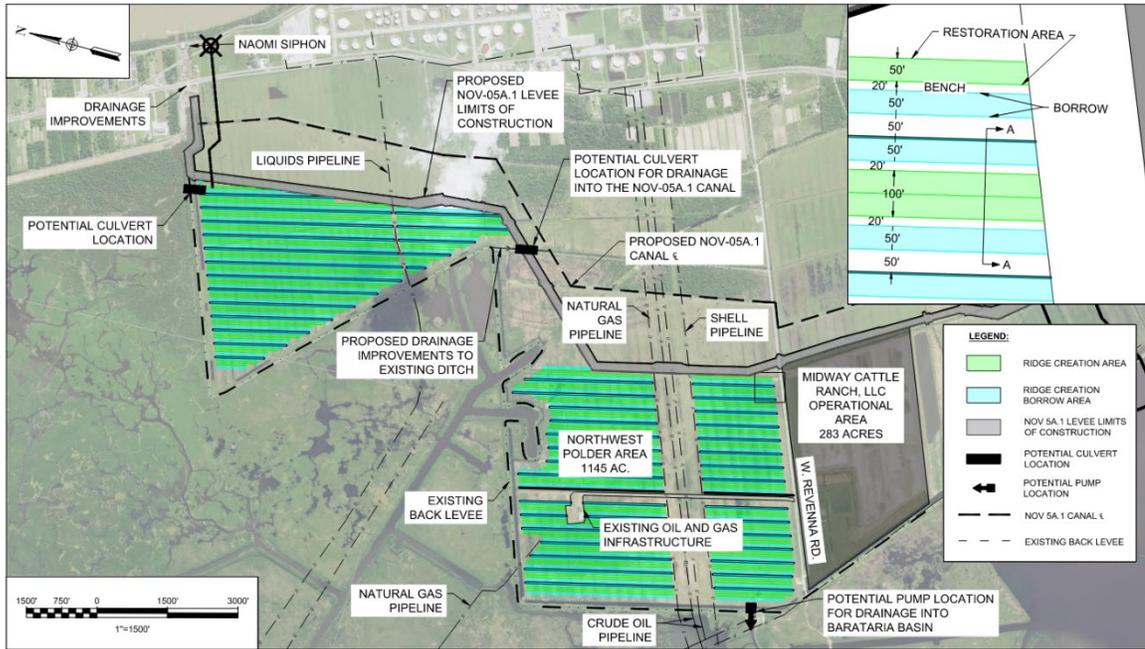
Bottomland Hardwood Forest Alternative
